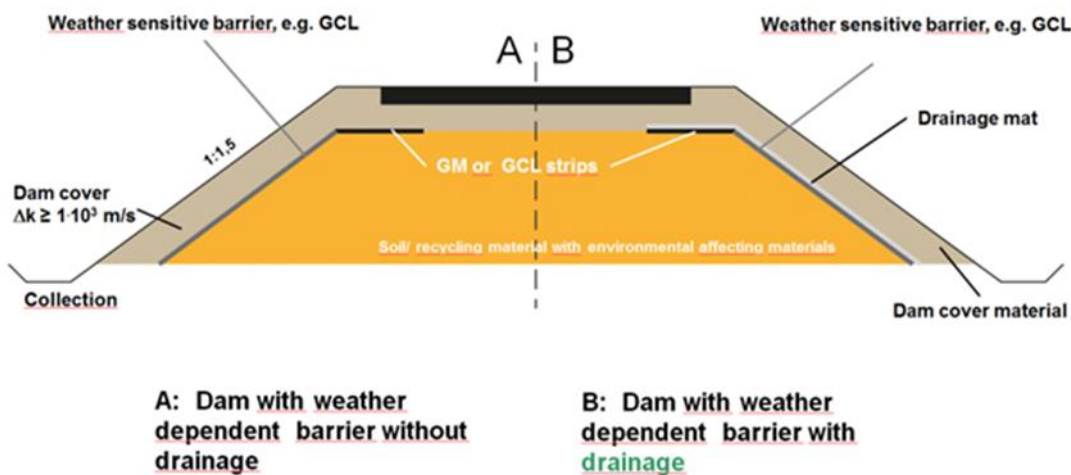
Typical cross section of geosynthetic barrier system for the encapsulation of contaminated soils in road constructions
